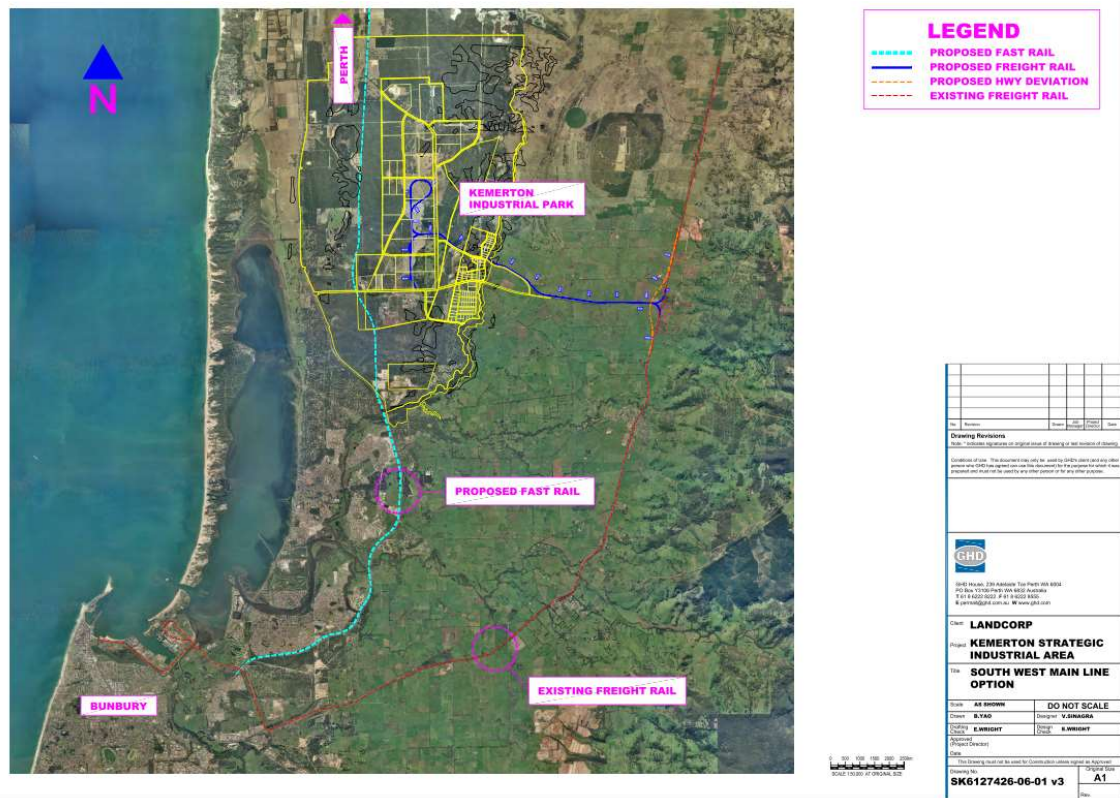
Possible layouts for a rail spur into the Kemerton site.
